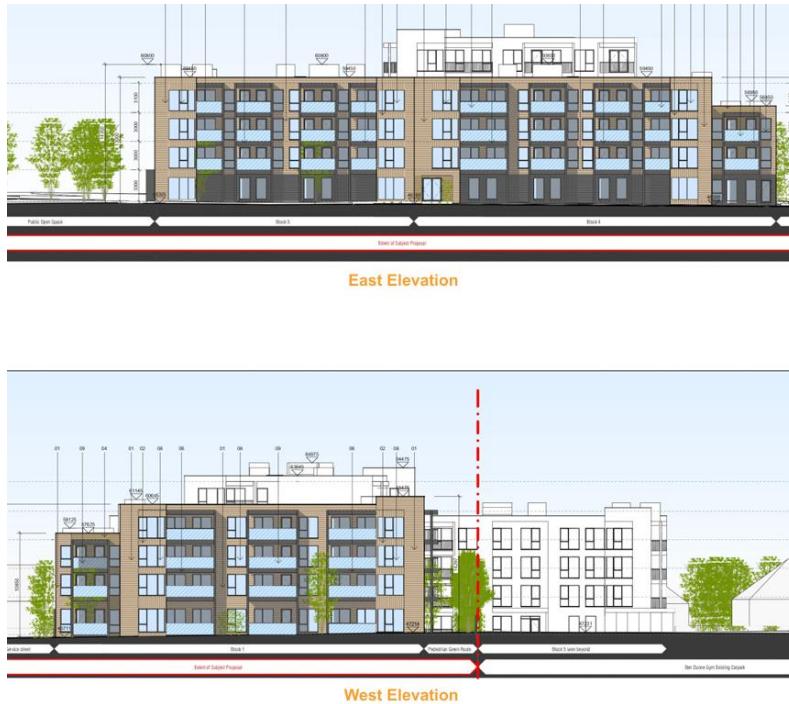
Elevations of the proposed buildings. Source: BKD Architects
